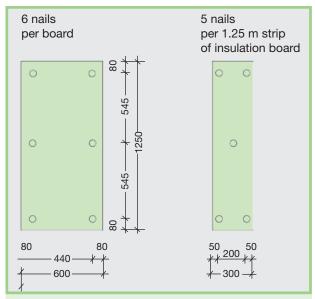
Possible amount and arrangement of plastic nails when placing Styrodur 2800 C boards in the concrete formwork (units in mm).
